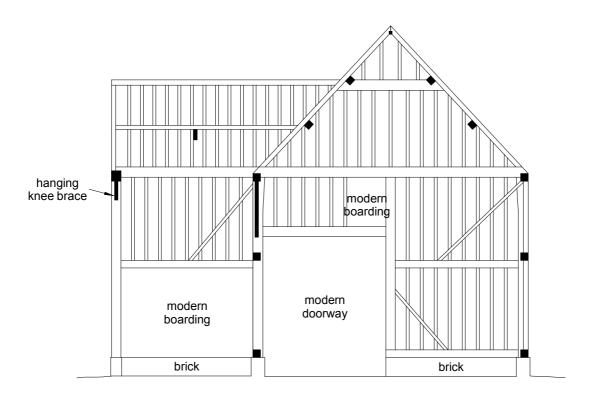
Building A, late 17th-century threshing barn: cross-section of truss B.
